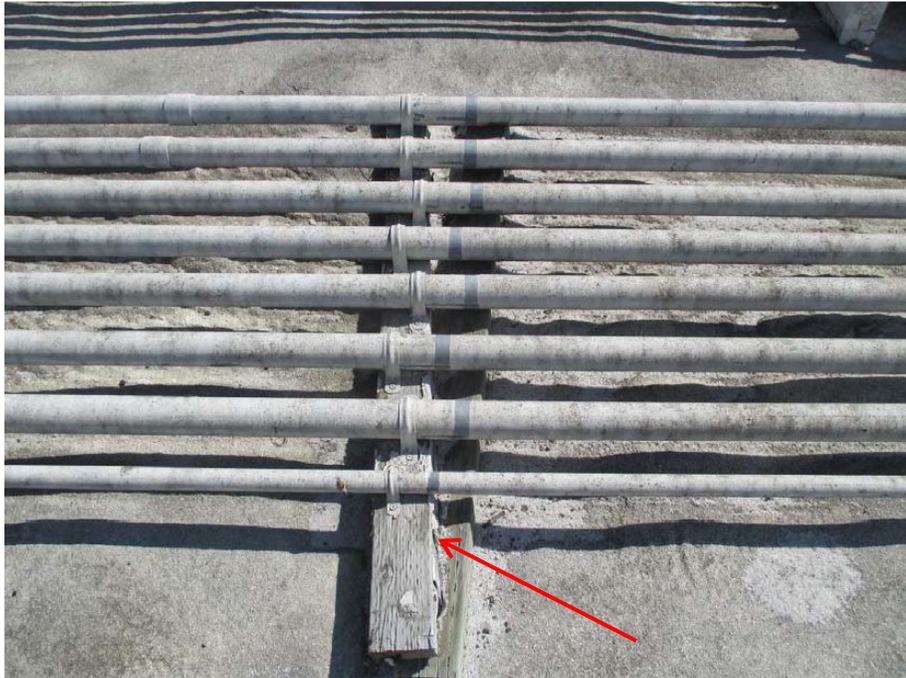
Shifted conduit at sleeper support, Harvest Middle School (photo by Quattrocchi Kwok Architects).
